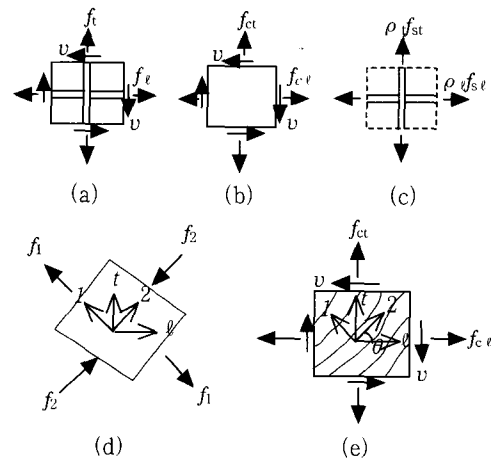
Reinforced concrete membrane elements subjected to in-plane stresses: (a) Reinforced concrete; (b) Concrete; (c) Reinforcement; (d) Principal axes 2-1 for stresses on concrete; (e) Assumed crack direction in rotating-angle Model
